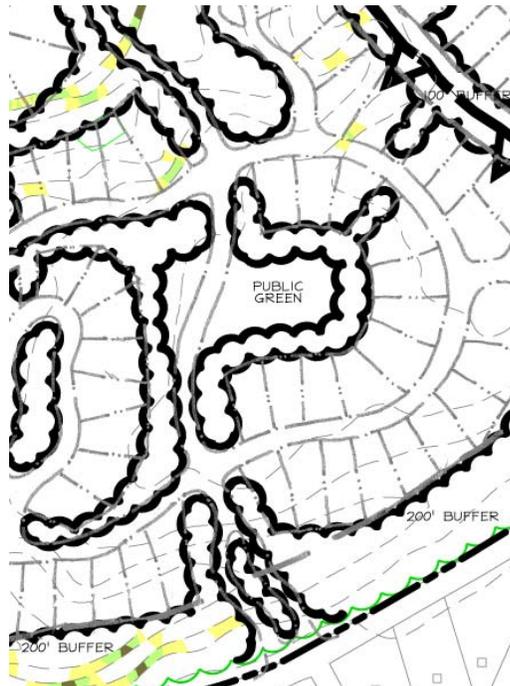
Figure A: Example of potential lot layout, site access and buffering adjacent existing roads and historic features.
